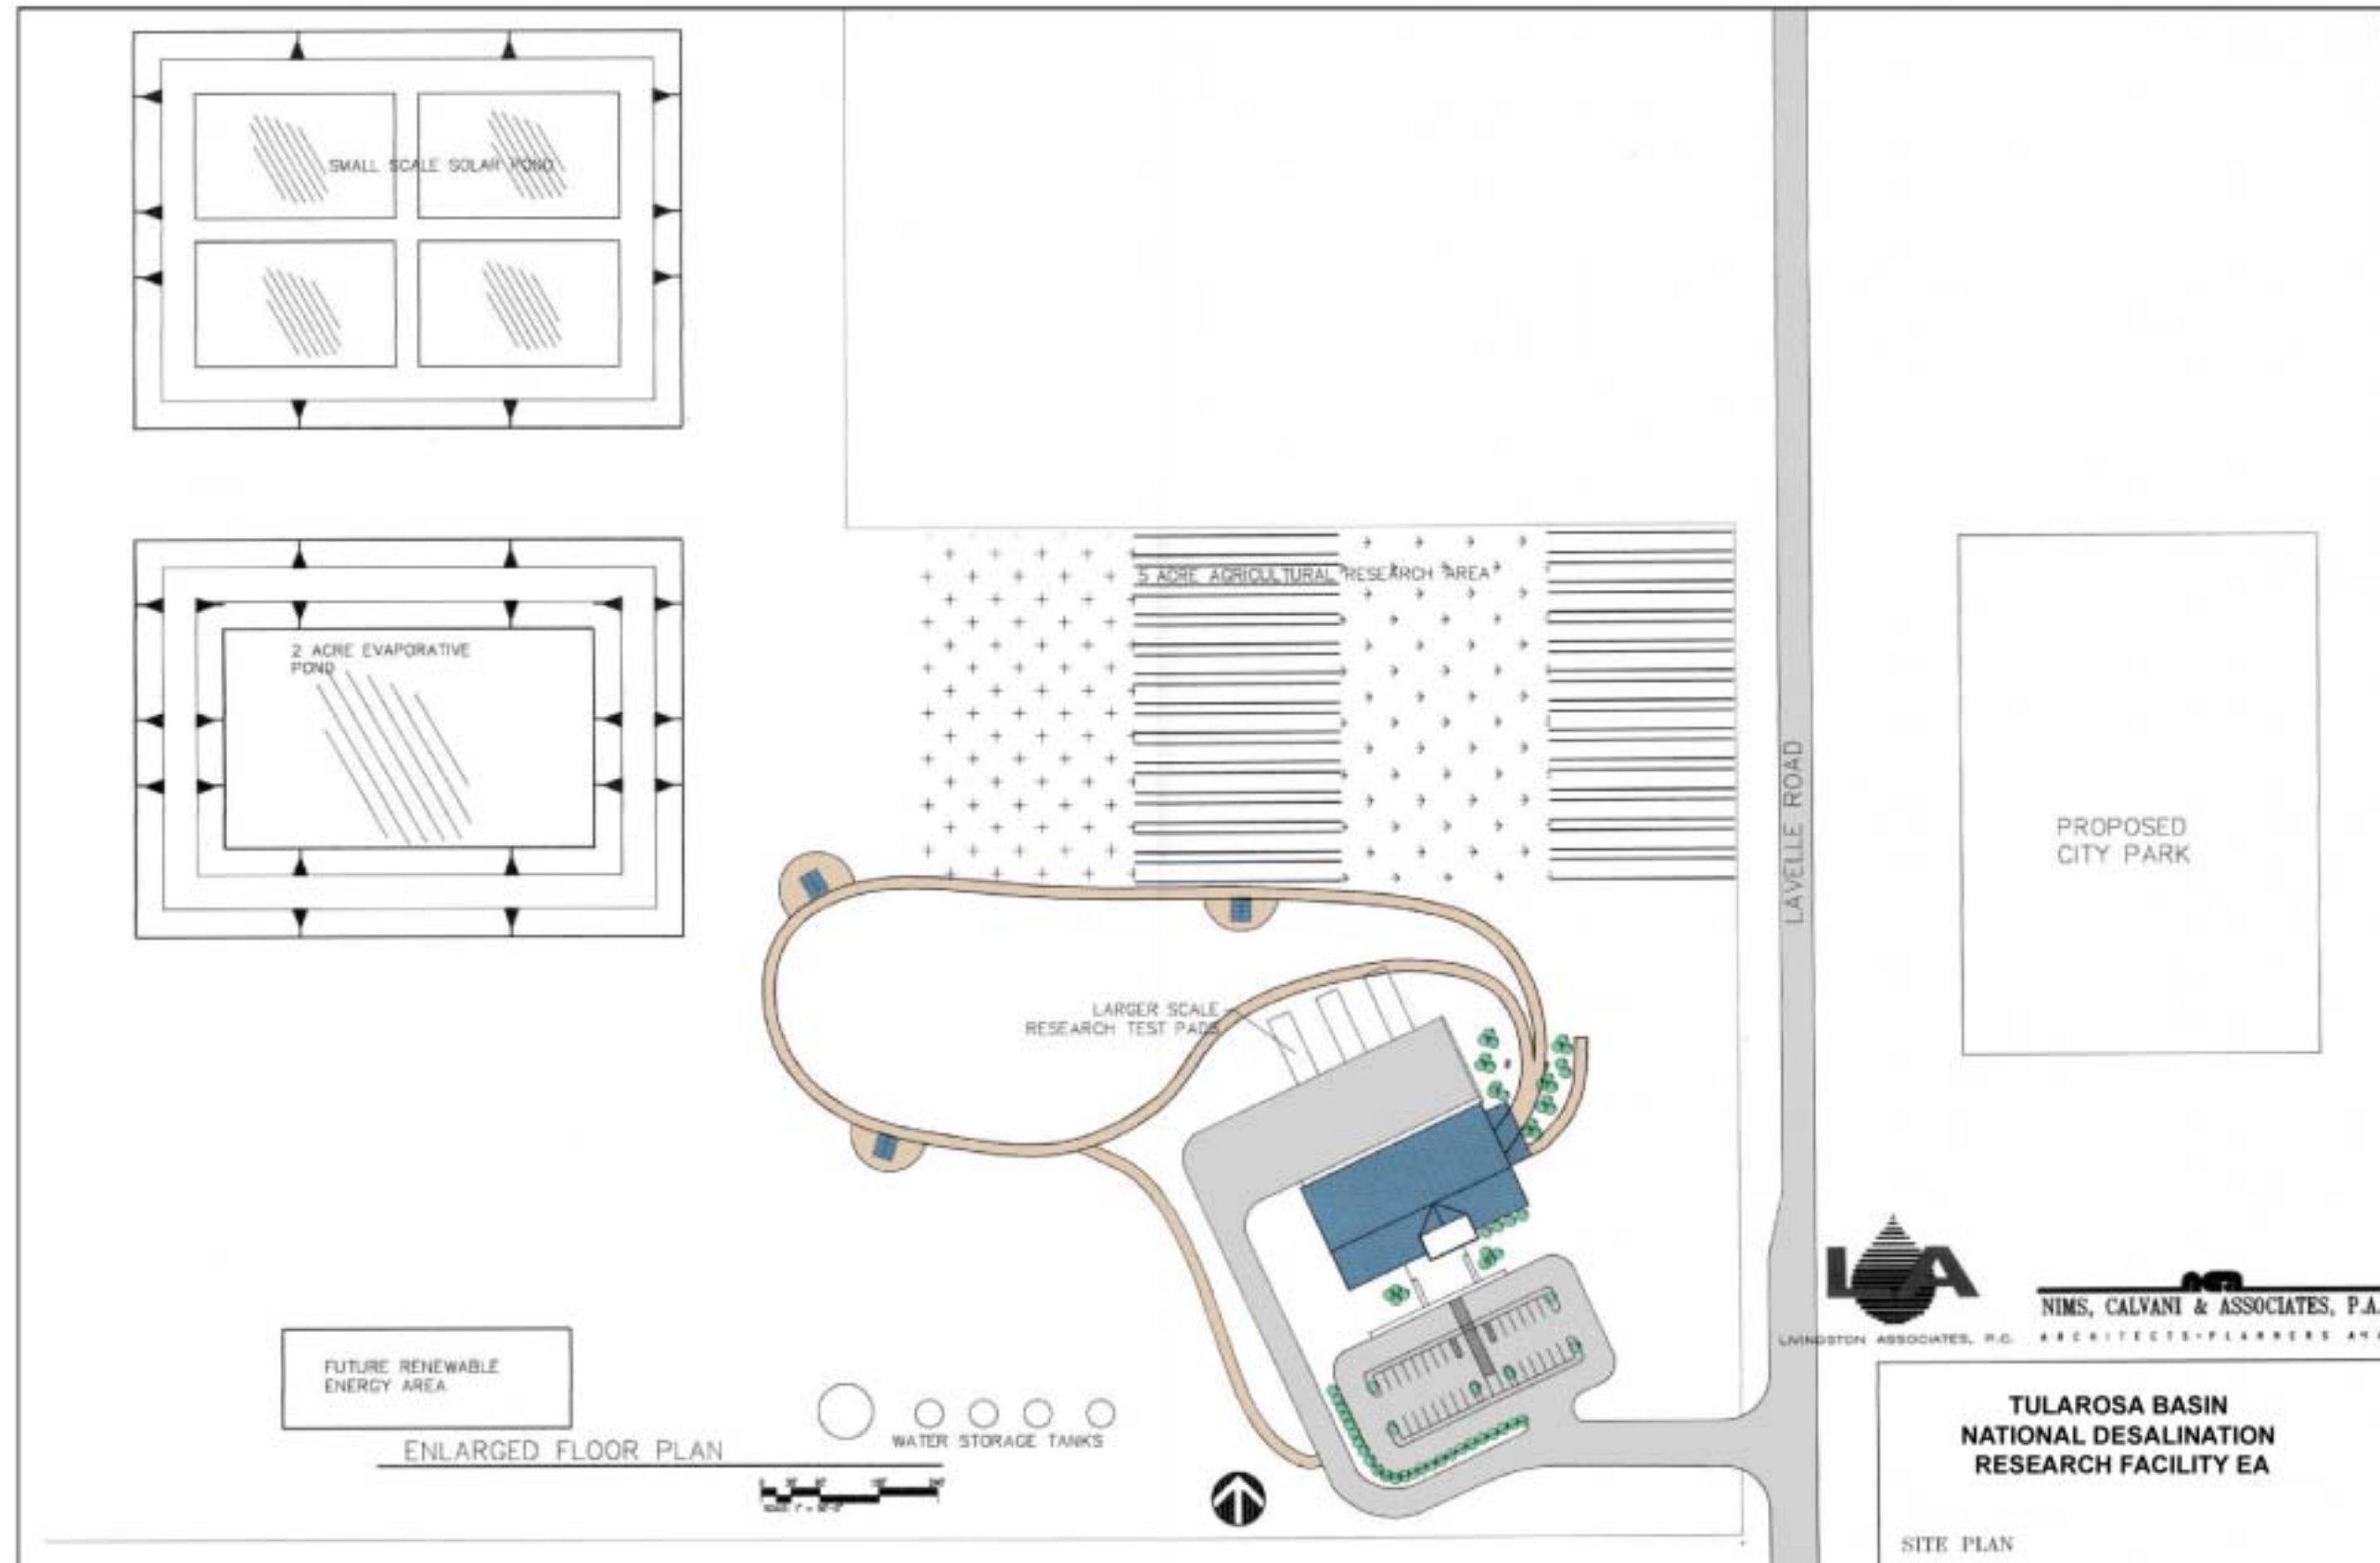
Tularosa Basin Desalination Research Facility Study site plan.
